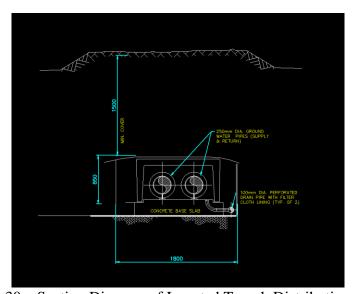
Section Diagram of Inverted Trench Distribution Piping
